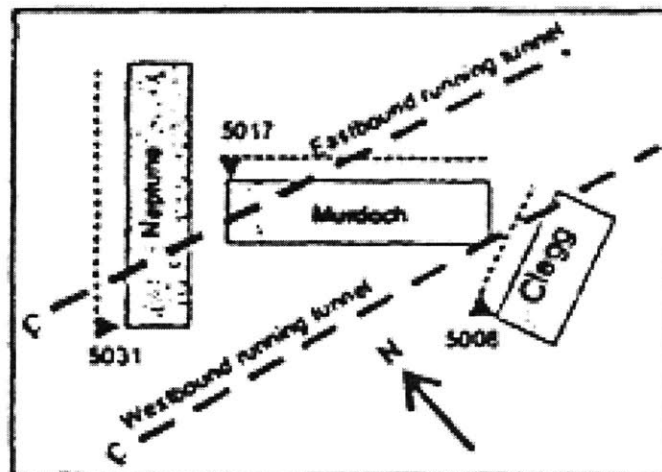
Plan view of Murdoch, Neptune and Clegg House (after Burland, Standing, Jardine, 2002)
